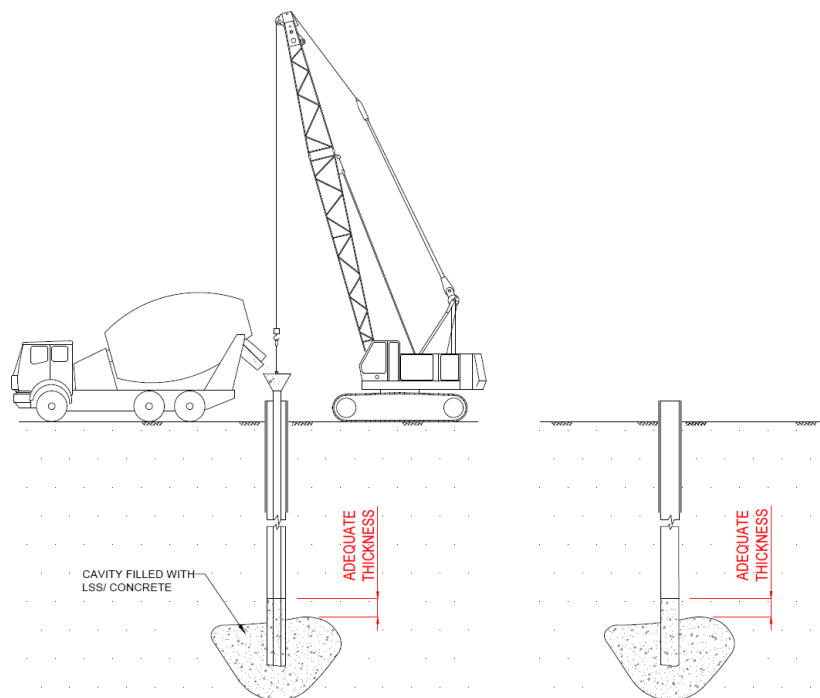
Cavity backfilling with lean concrete or LSS during pile boring works
